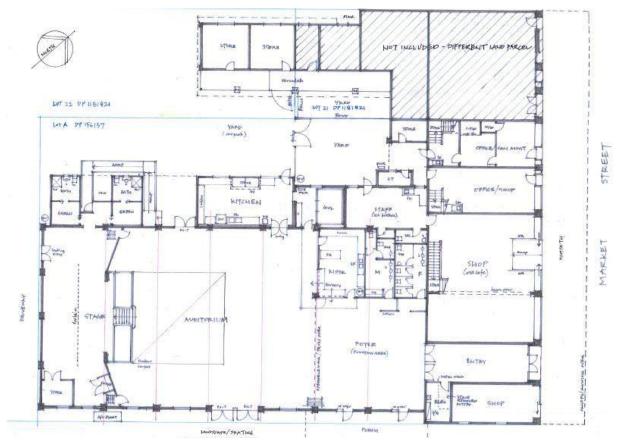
Ground Floor Plan for the Theatre Royal building – Noel Thomson Architecture
